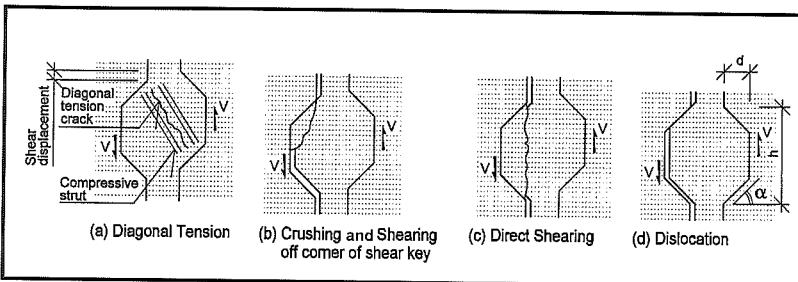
Failure Modes Of Joint Concrete In Shear Key
